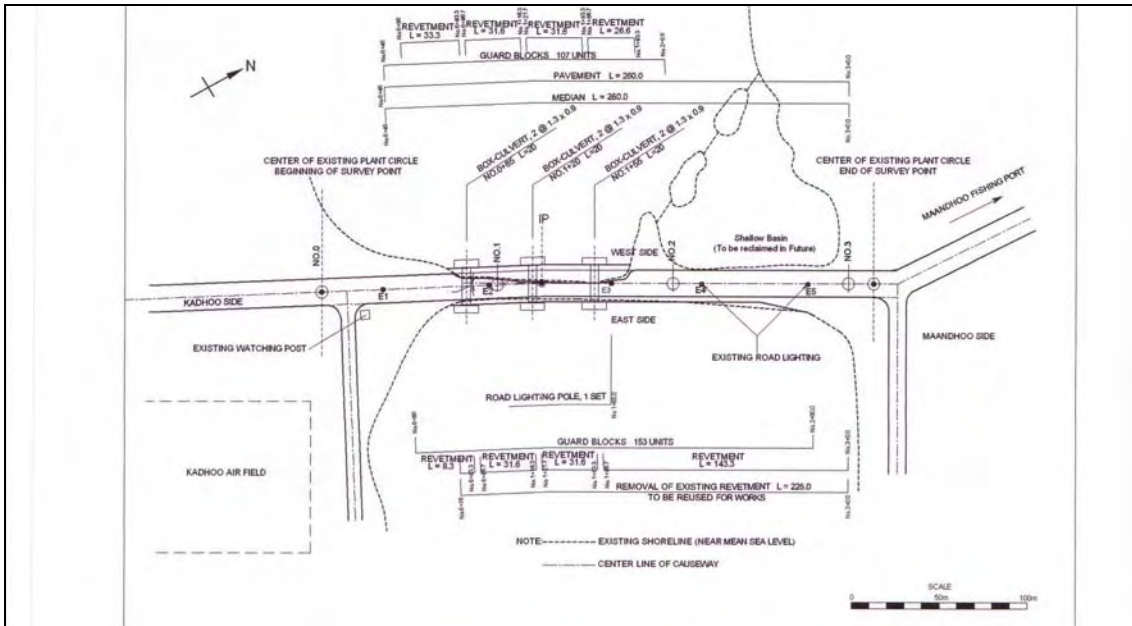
General Plan of Causeway No.1 (Kadhoo-Maandhoo)
